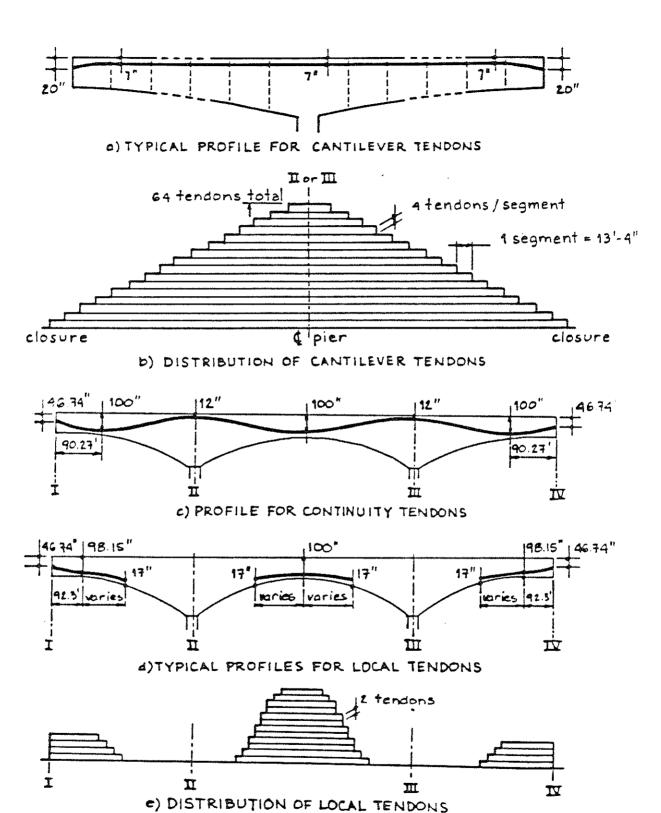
PRESTRESSING TENDON LAYOUT Ketchum [27]
